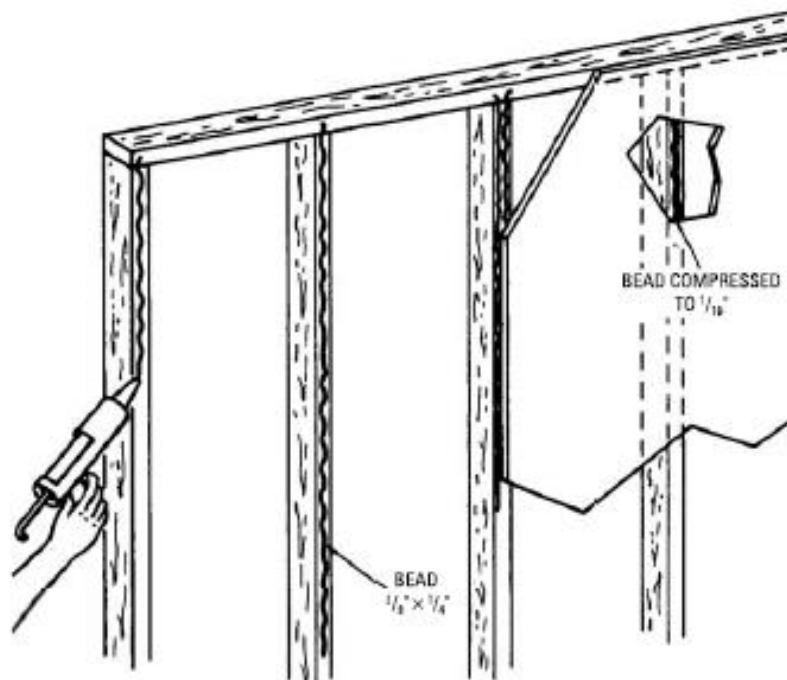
Adhesive applied directly to wall studs. The adhesive is applied in a wavy line the full length of the stud. (Courtesy National Gypsum Co.)
